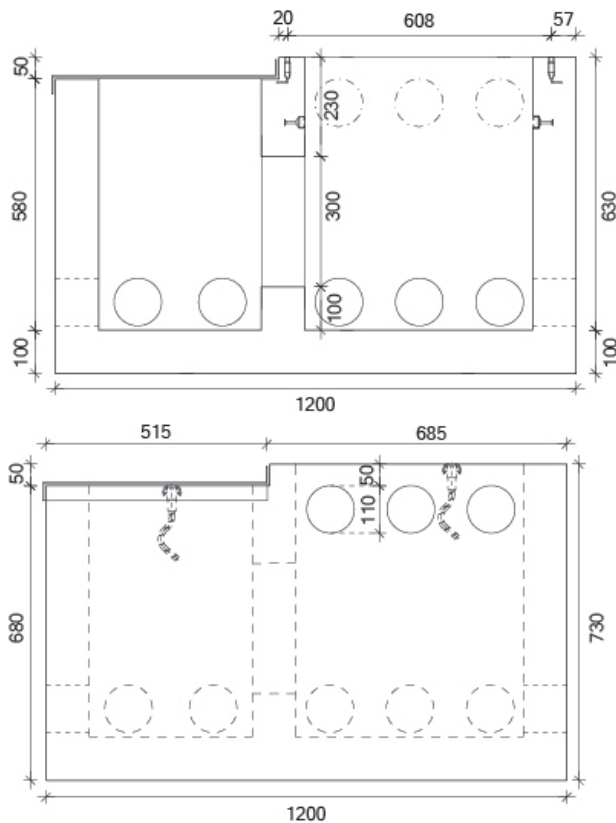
Indicative drawing for single cabinet's concrete foundation, top view (mm)
